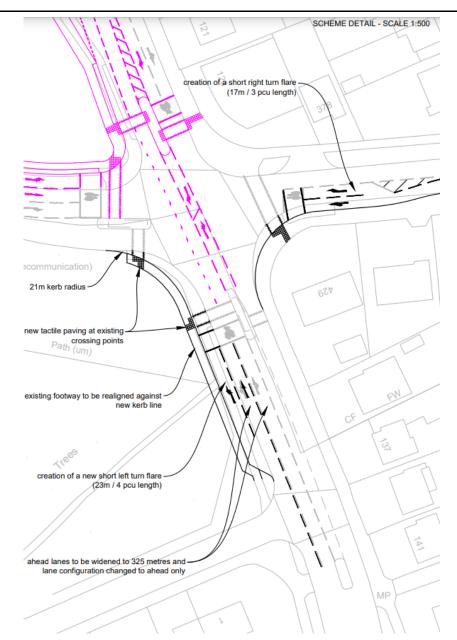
Proposed Merrill Way/A514 Junction Improvement Proposed 'With New A50(T) Junction and Link Road Scheme' Constructed.
